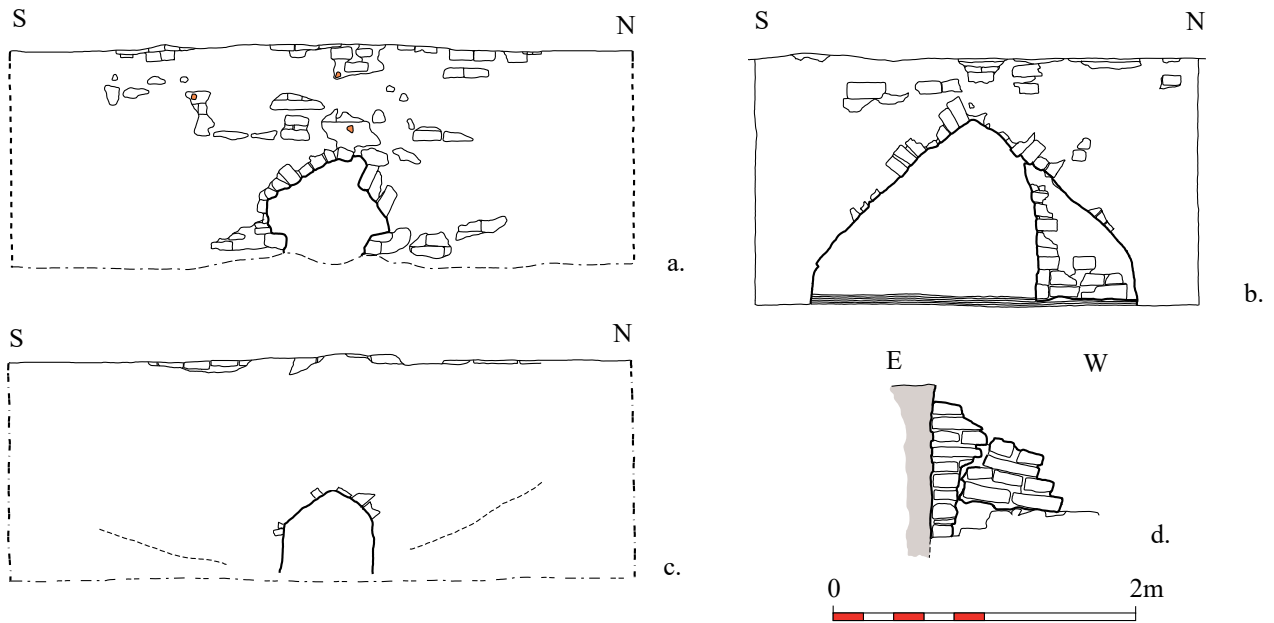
Building F3. Elevations of the walls. a. the exterior face of the west wall; b. the east face of the third cross wall from the west; c. the exterior face of the east wall; d. the two period revetting wall on the south side of the west stoke-hole (scale 1:50).
